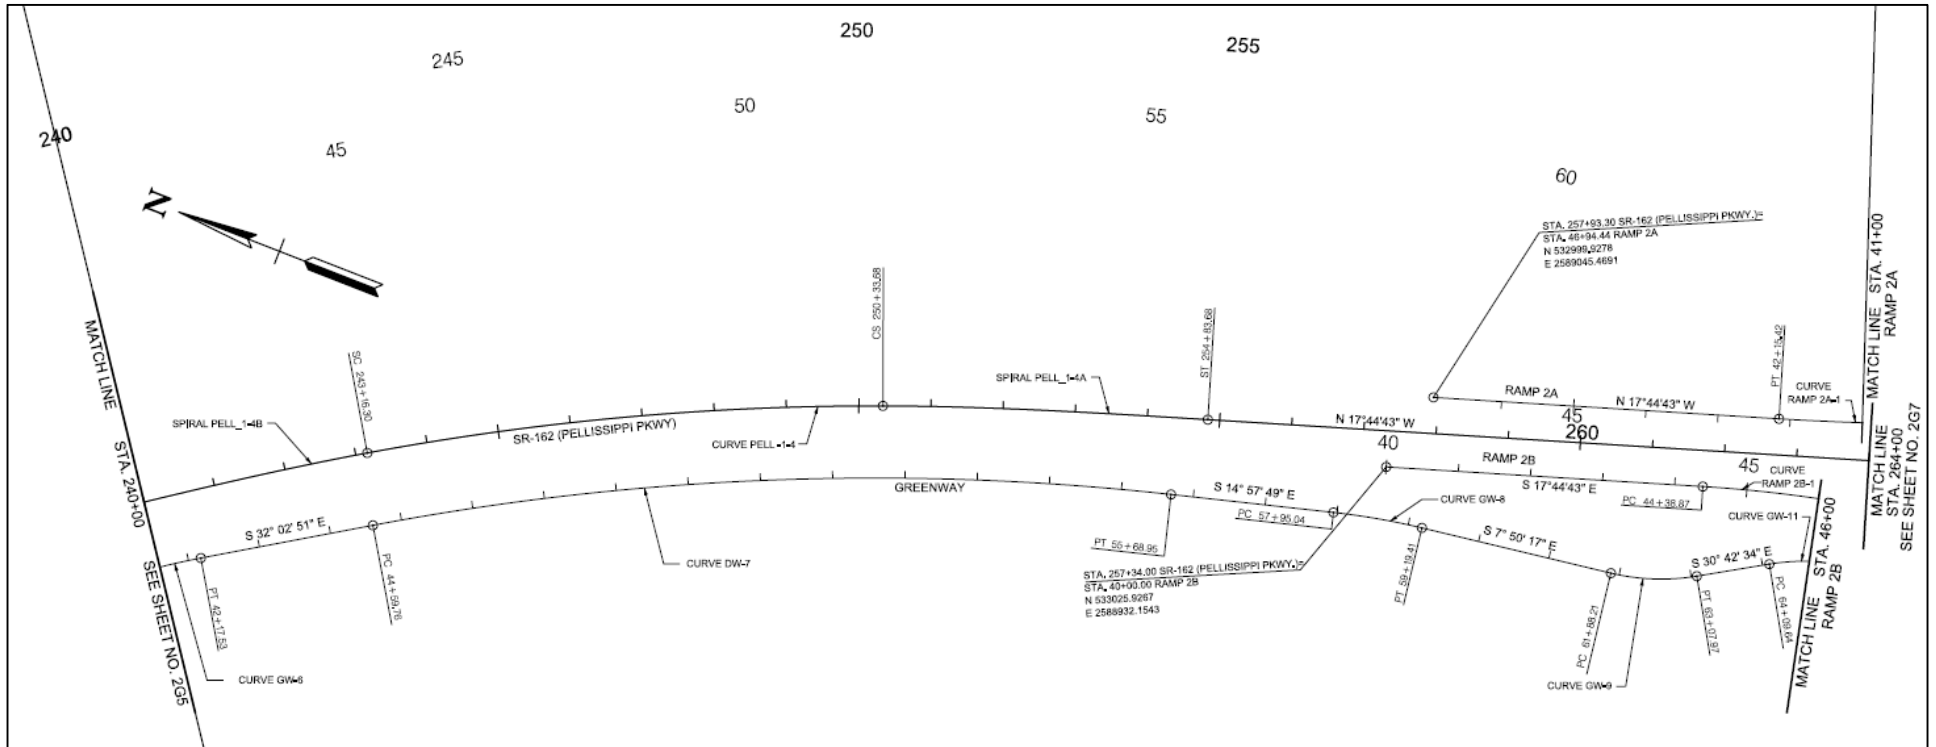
Overview 7 of 11 of the SR-162 Road Extension project from north to south.
